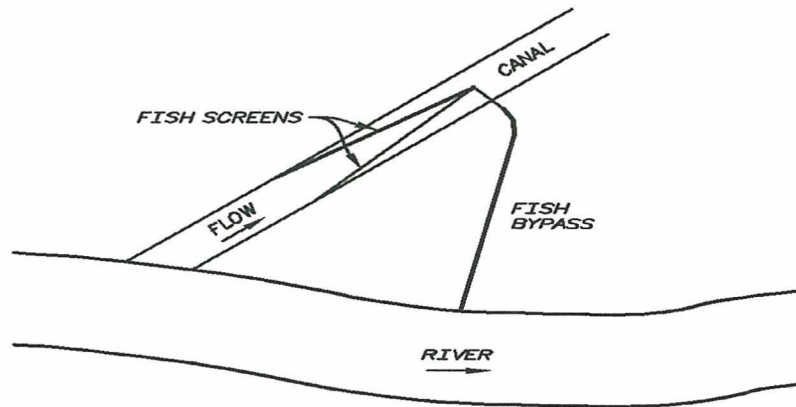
Typical layout of a "V" shaped fish screen structure.
